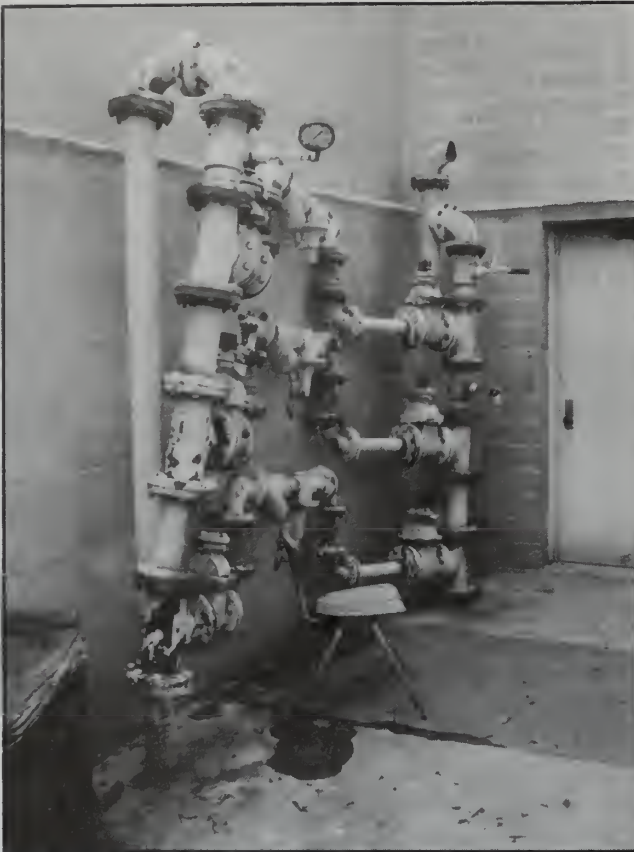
Earthquake damage to large utility piping in Kennedy High School.
